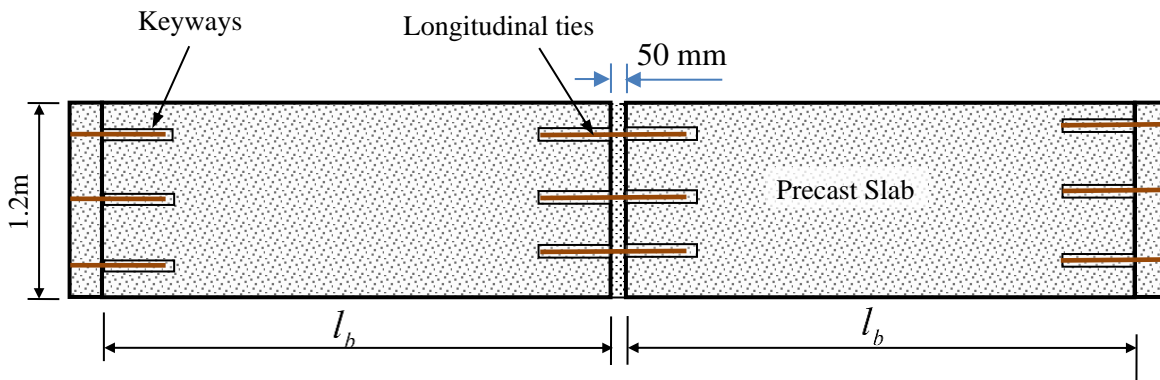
Floor-to-floor system facilitated by longitudinal ties.
